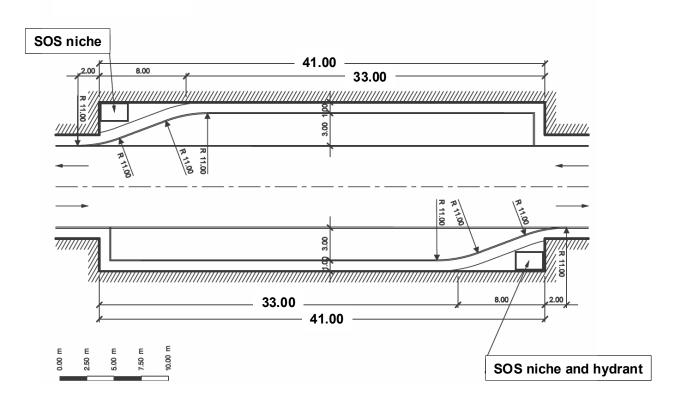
Dimension of emrgency places in Swiss road tunnels
